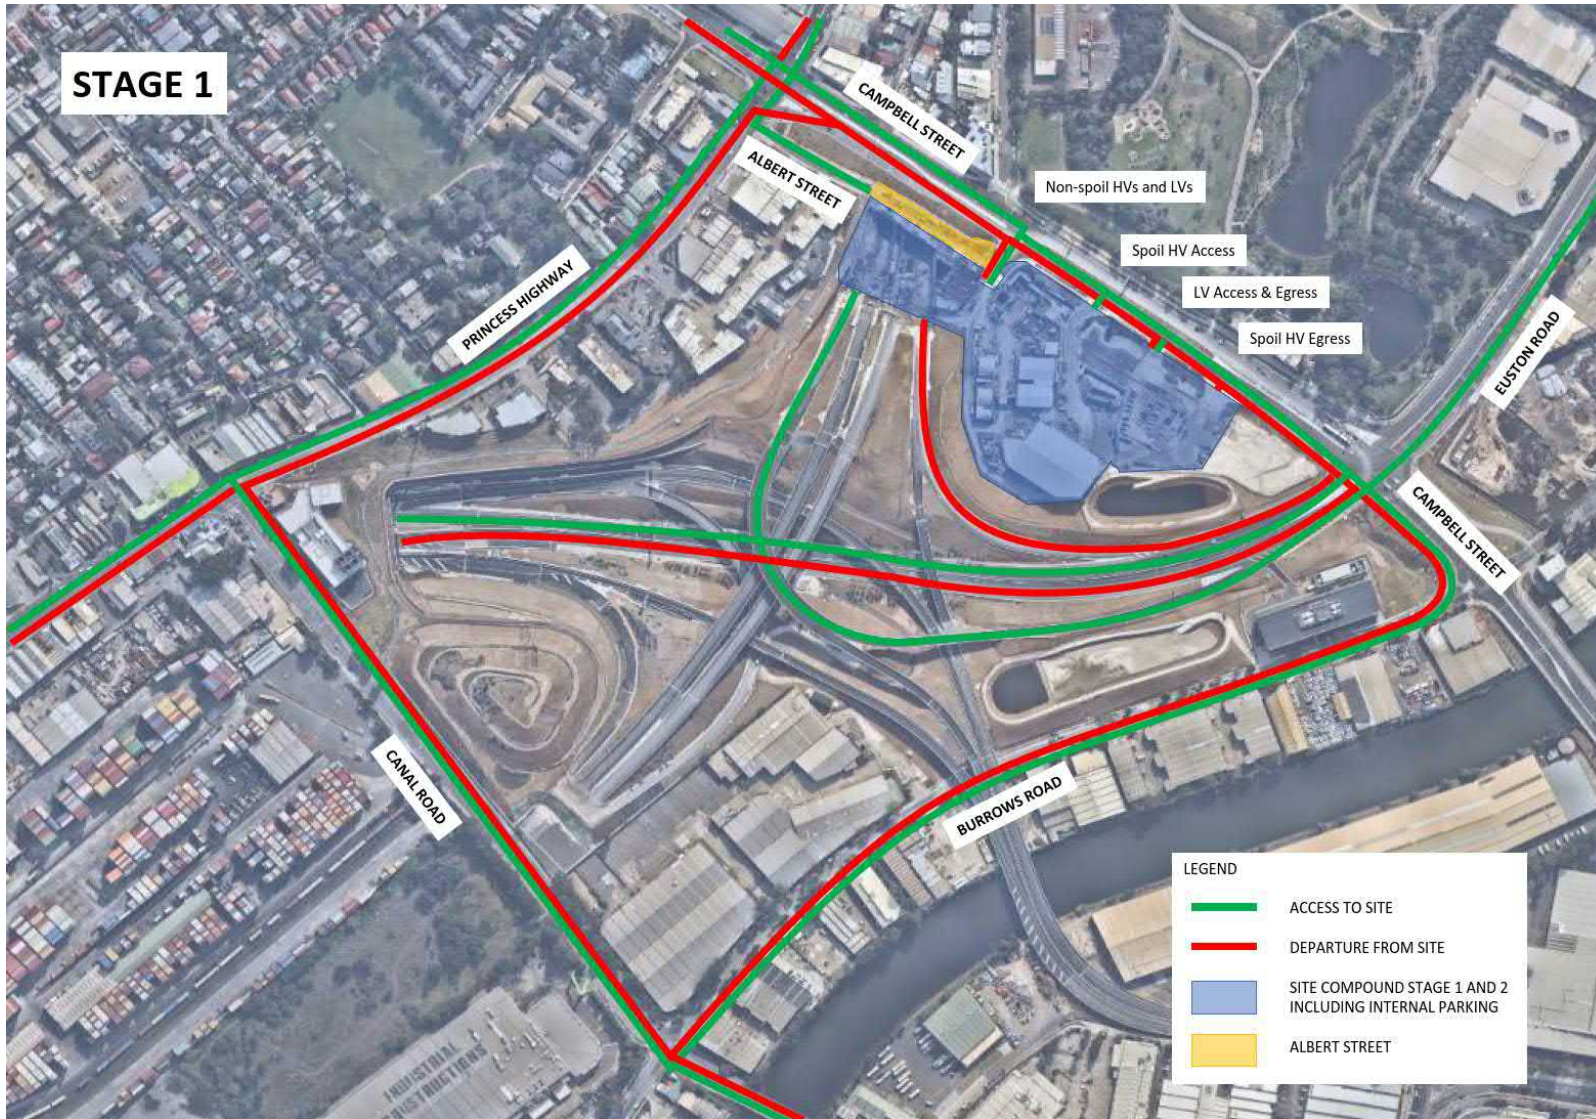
Campbell Road civil and tunnel site layout - Stage 1
